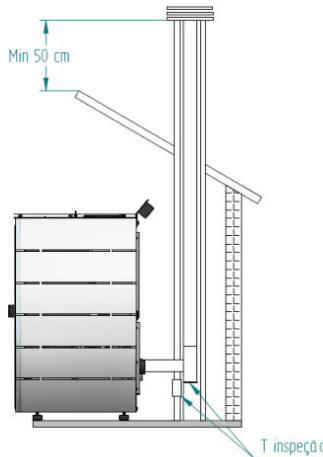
Side view of the installation without a chimney, showing the inspection point
